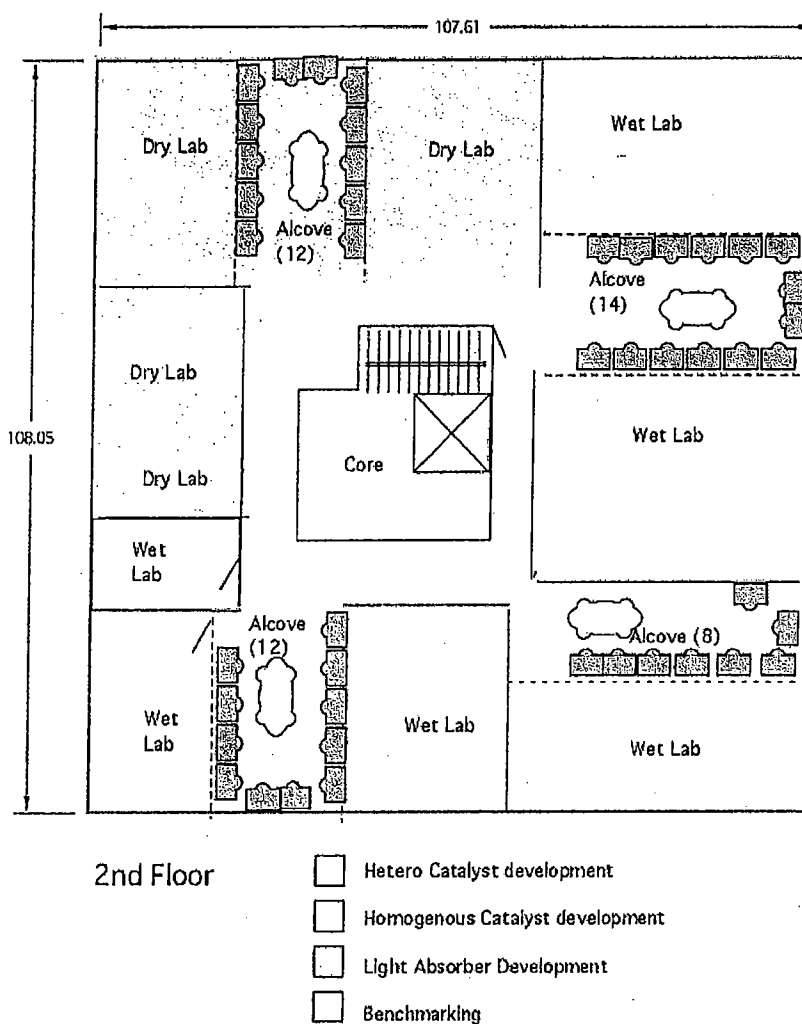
Conceptual layout of top floor of Caltech Hub.
